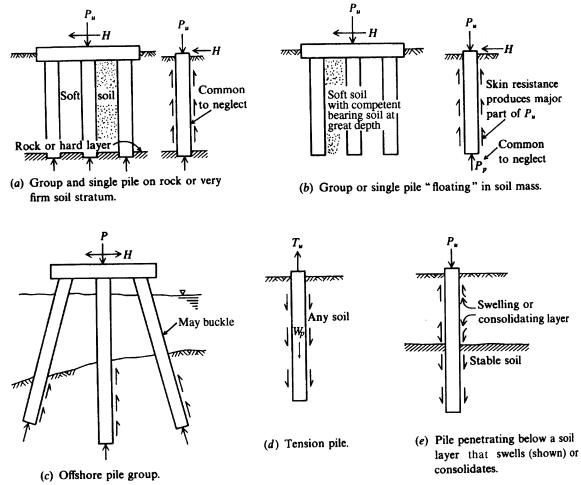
Illustration of Typical Pile Configurations (from Bowles, 1996)
